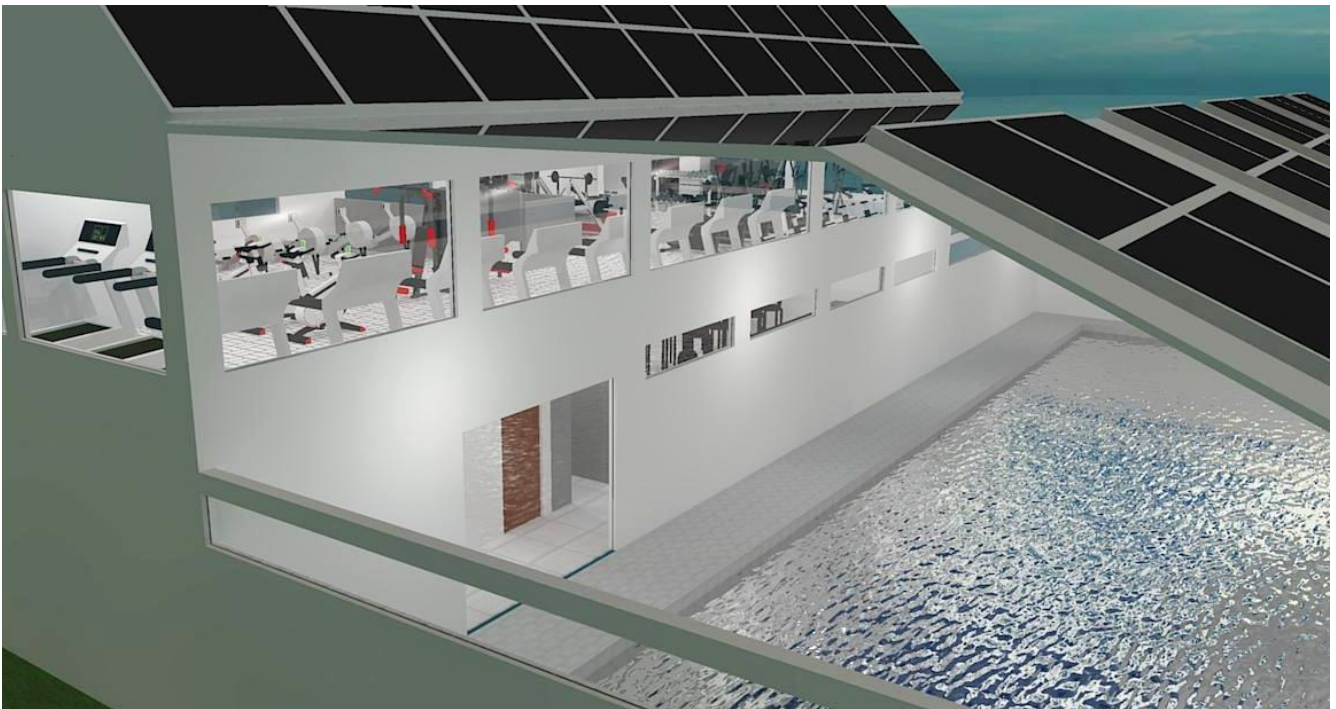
External view, showing the solar panels on the roof, the equipment on the upper floor and the pool on the ground floor.
